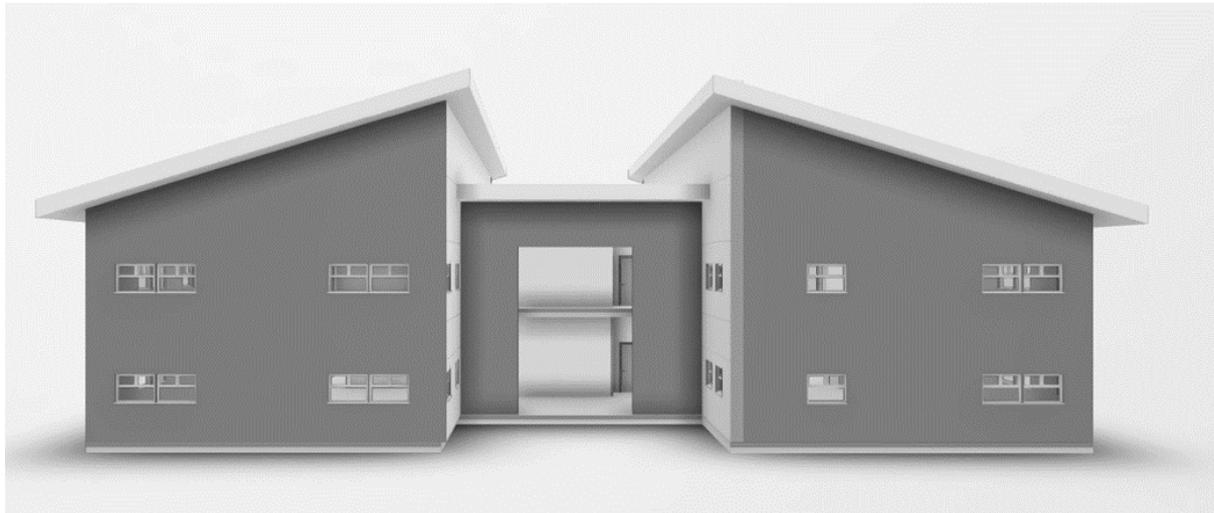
North elevation, Villa Irti, Italy (Source: COAF)
